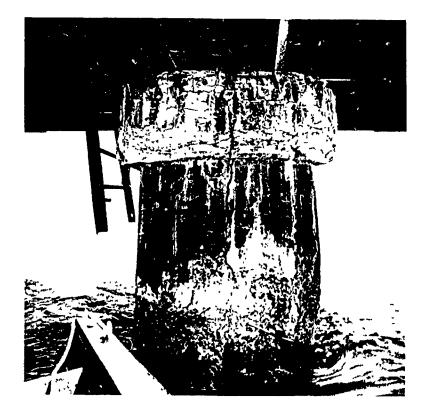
TYPICAL PIER DAMAGE
